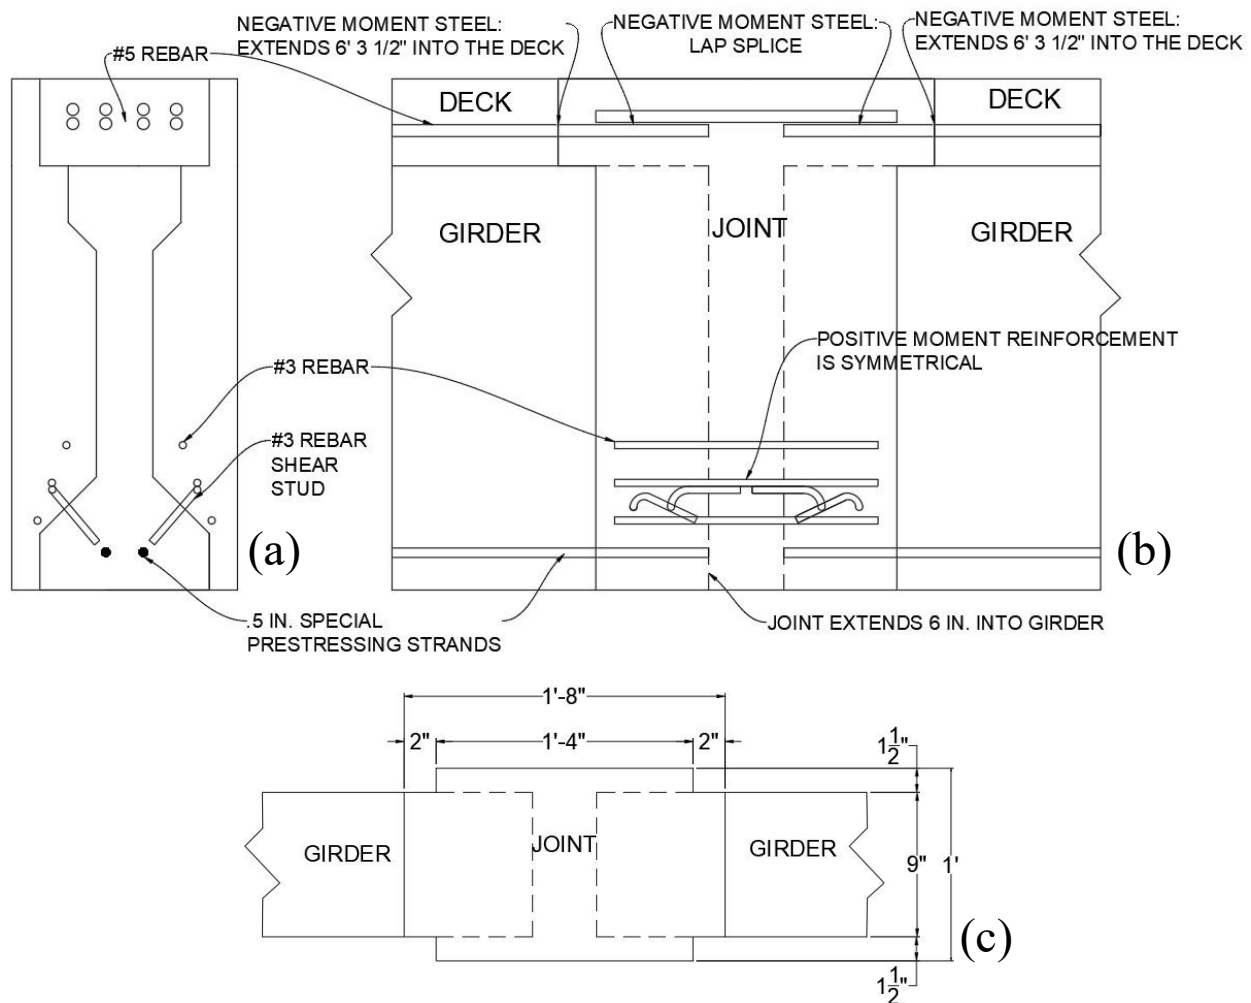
Retrofit continuity joint cross-section (a), elevation view (b), and plan view (c)
